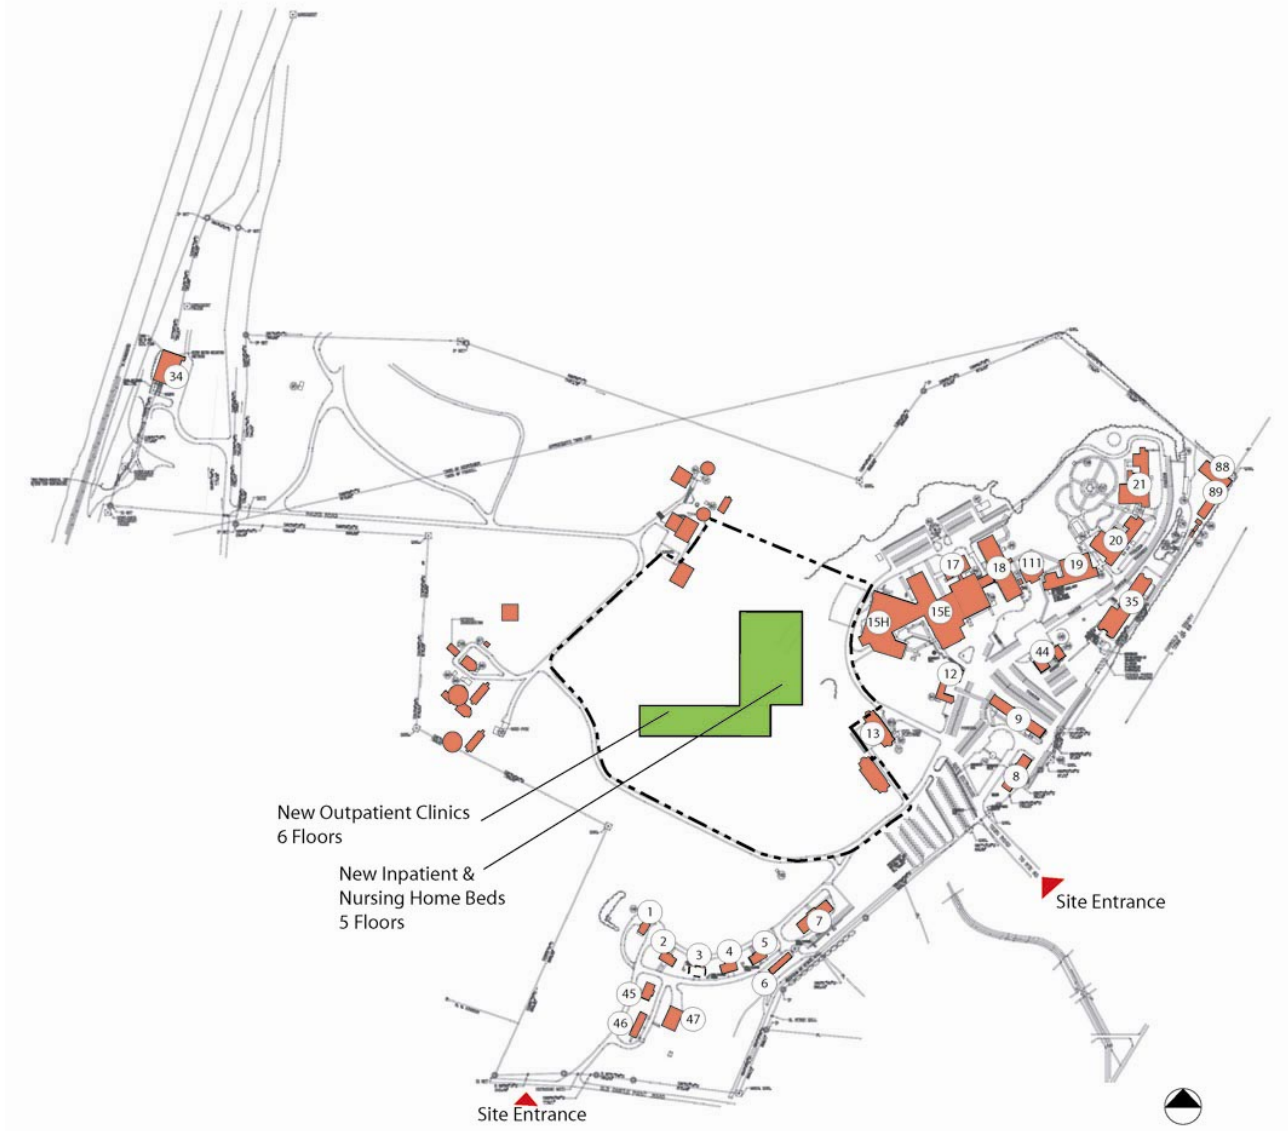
Proposed New Site Plan - BPO 8 (At Castle Point, Construct All New Facilities South of Existing Buildings)
